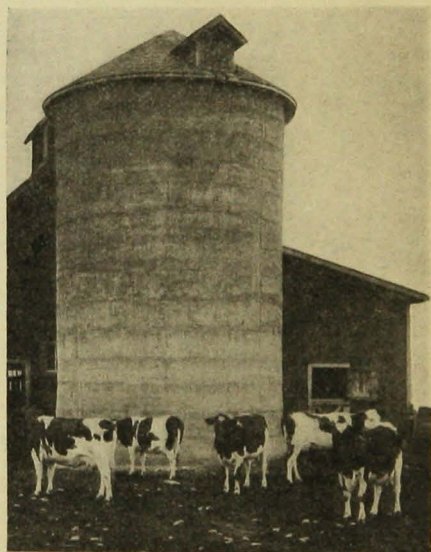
Home-Made Solid-Wall Concrete Silo, Crow Wing County
